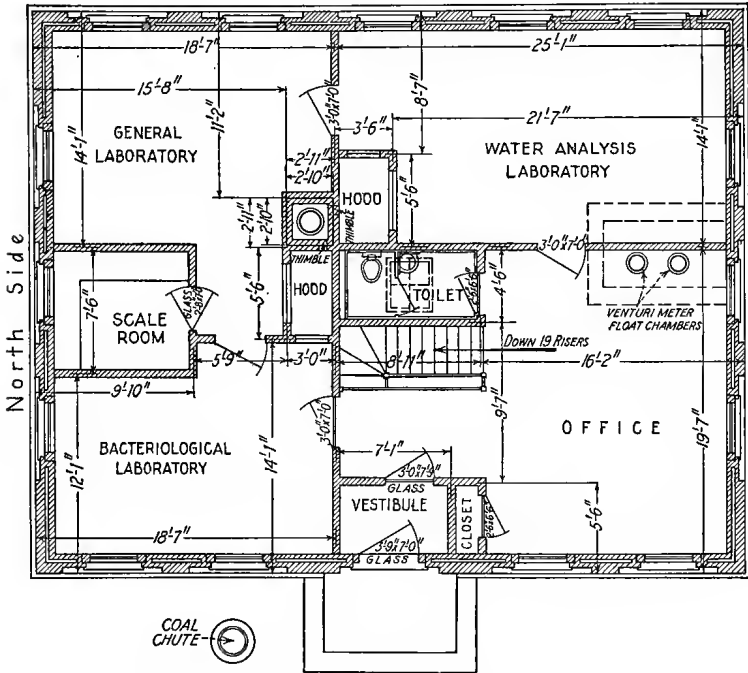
Plan of sewage-works laboratory at Fitchburg, Mass.
